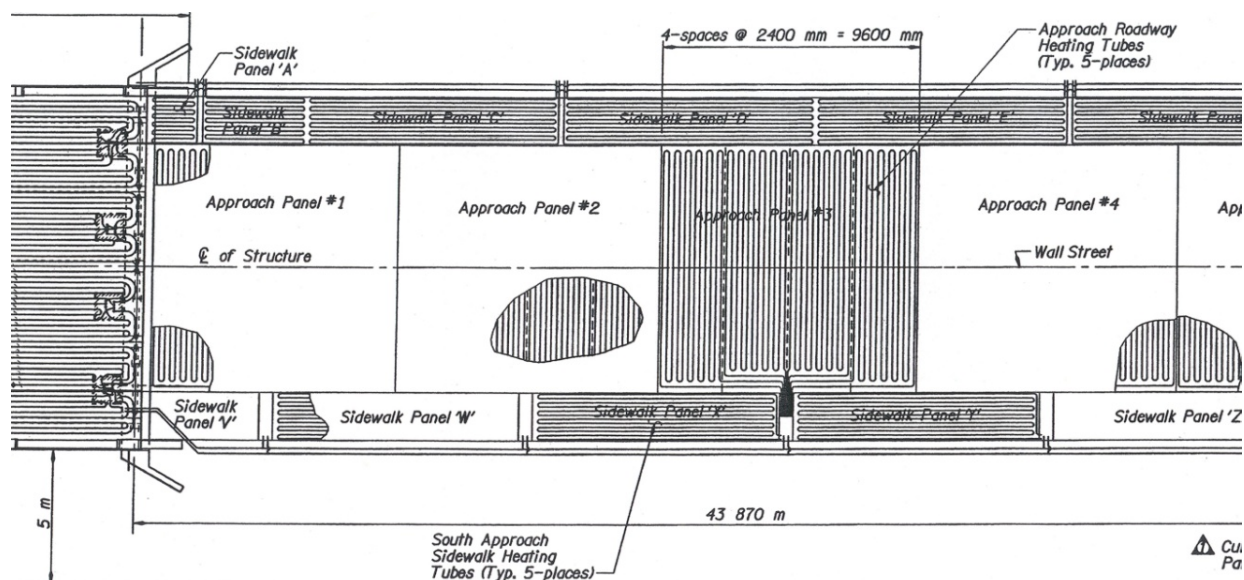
Details of the PEX piping system for a highway PCC pavement and bridge deck in Klamath Falls, Oregon, USA (Boyd, 2003).
